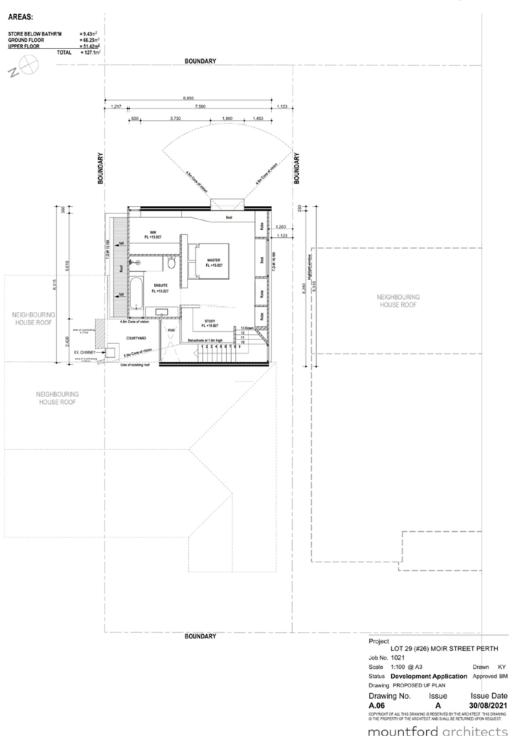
PROPOSED UPPER FLOOR PLAN Mountford Architects
